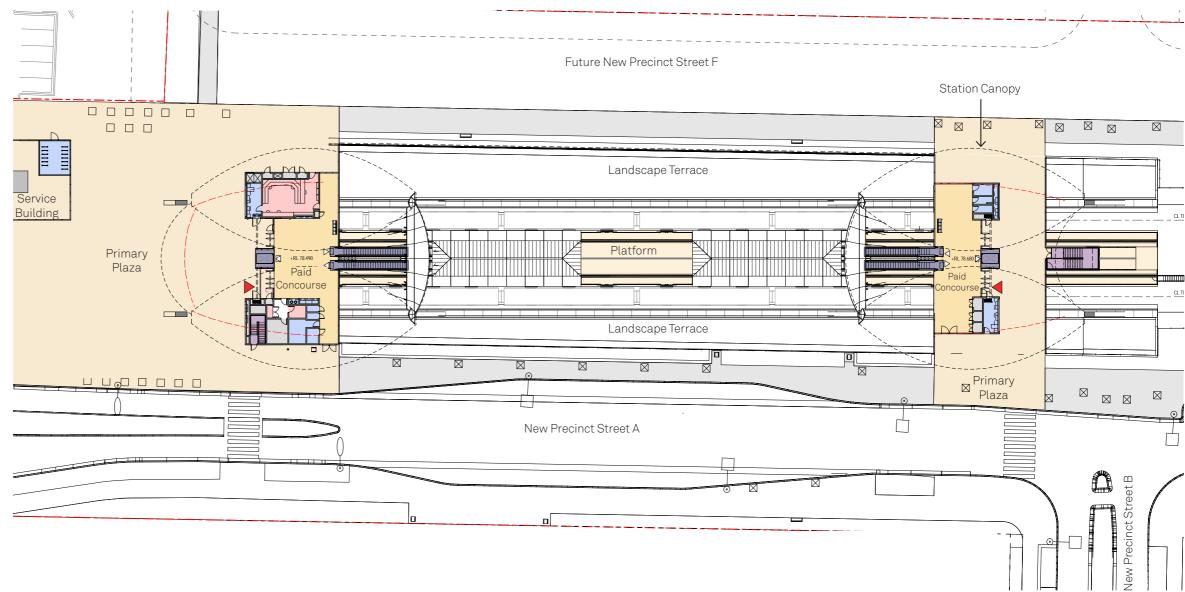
BLV\_Concourse Level Plan. Source: HASSELL.
